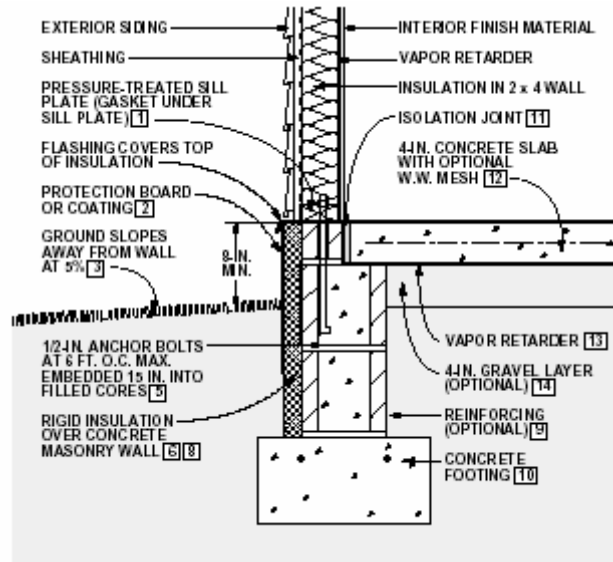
illustrates a slab-on-grade foundation with a concrete masonry foundation wall. Rigid insulation is placed vertically on the exterior face of the foundation wall. The top of the insulation is covered by flashing. Because the floor slab rests on the ledge of the foundation wall, it is important to compact the soil beneath the slab to minimize settlement and cracking of the slab.
